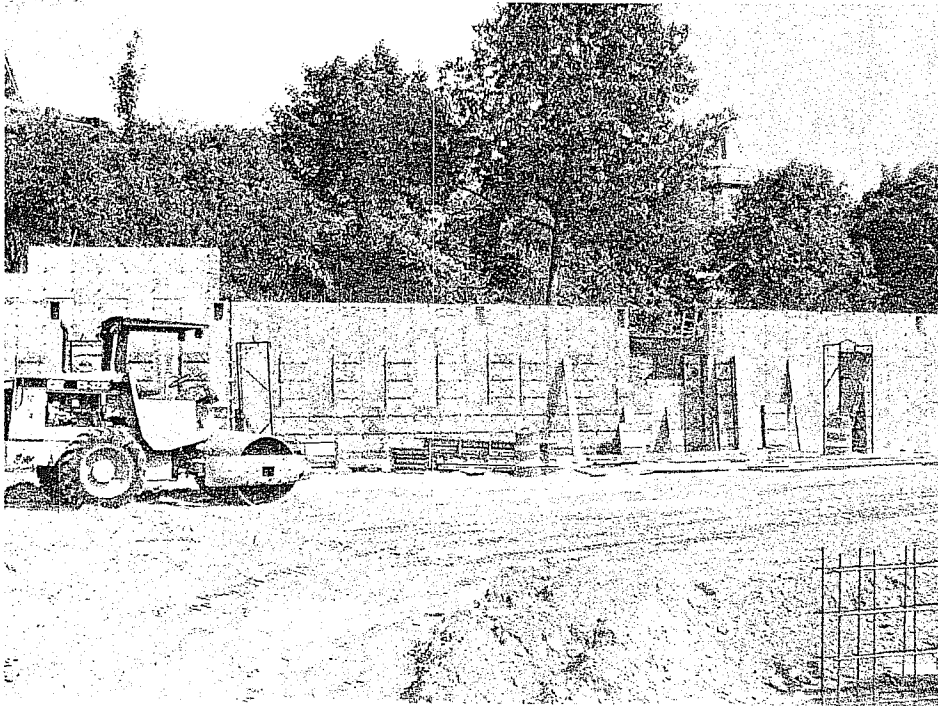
Foundation Wall at Grid N – Note Opening for Stair B
